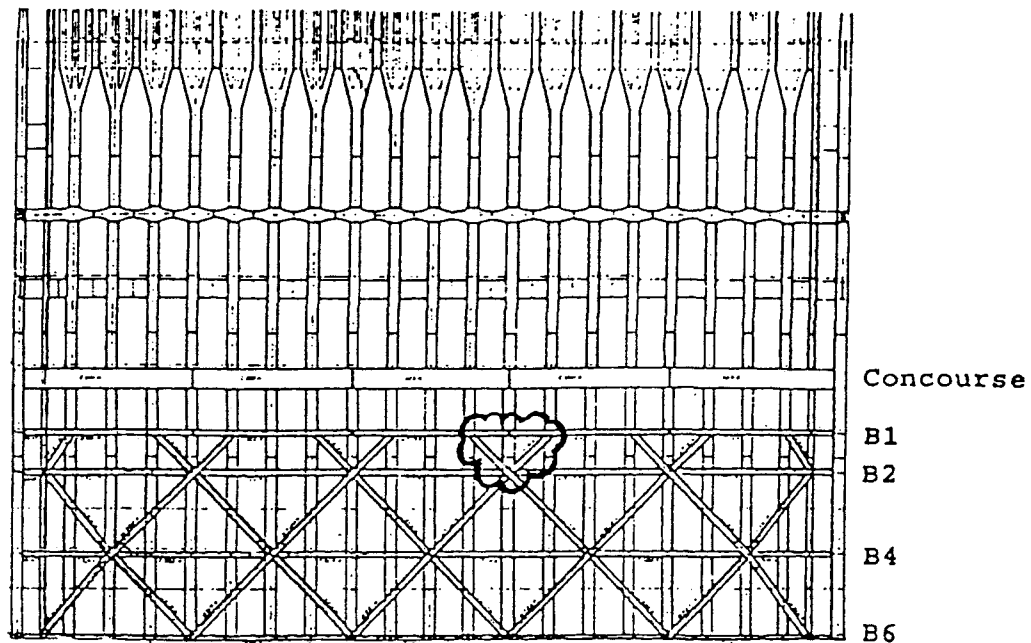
South elevation of Tower 1, indicating damaged area.
